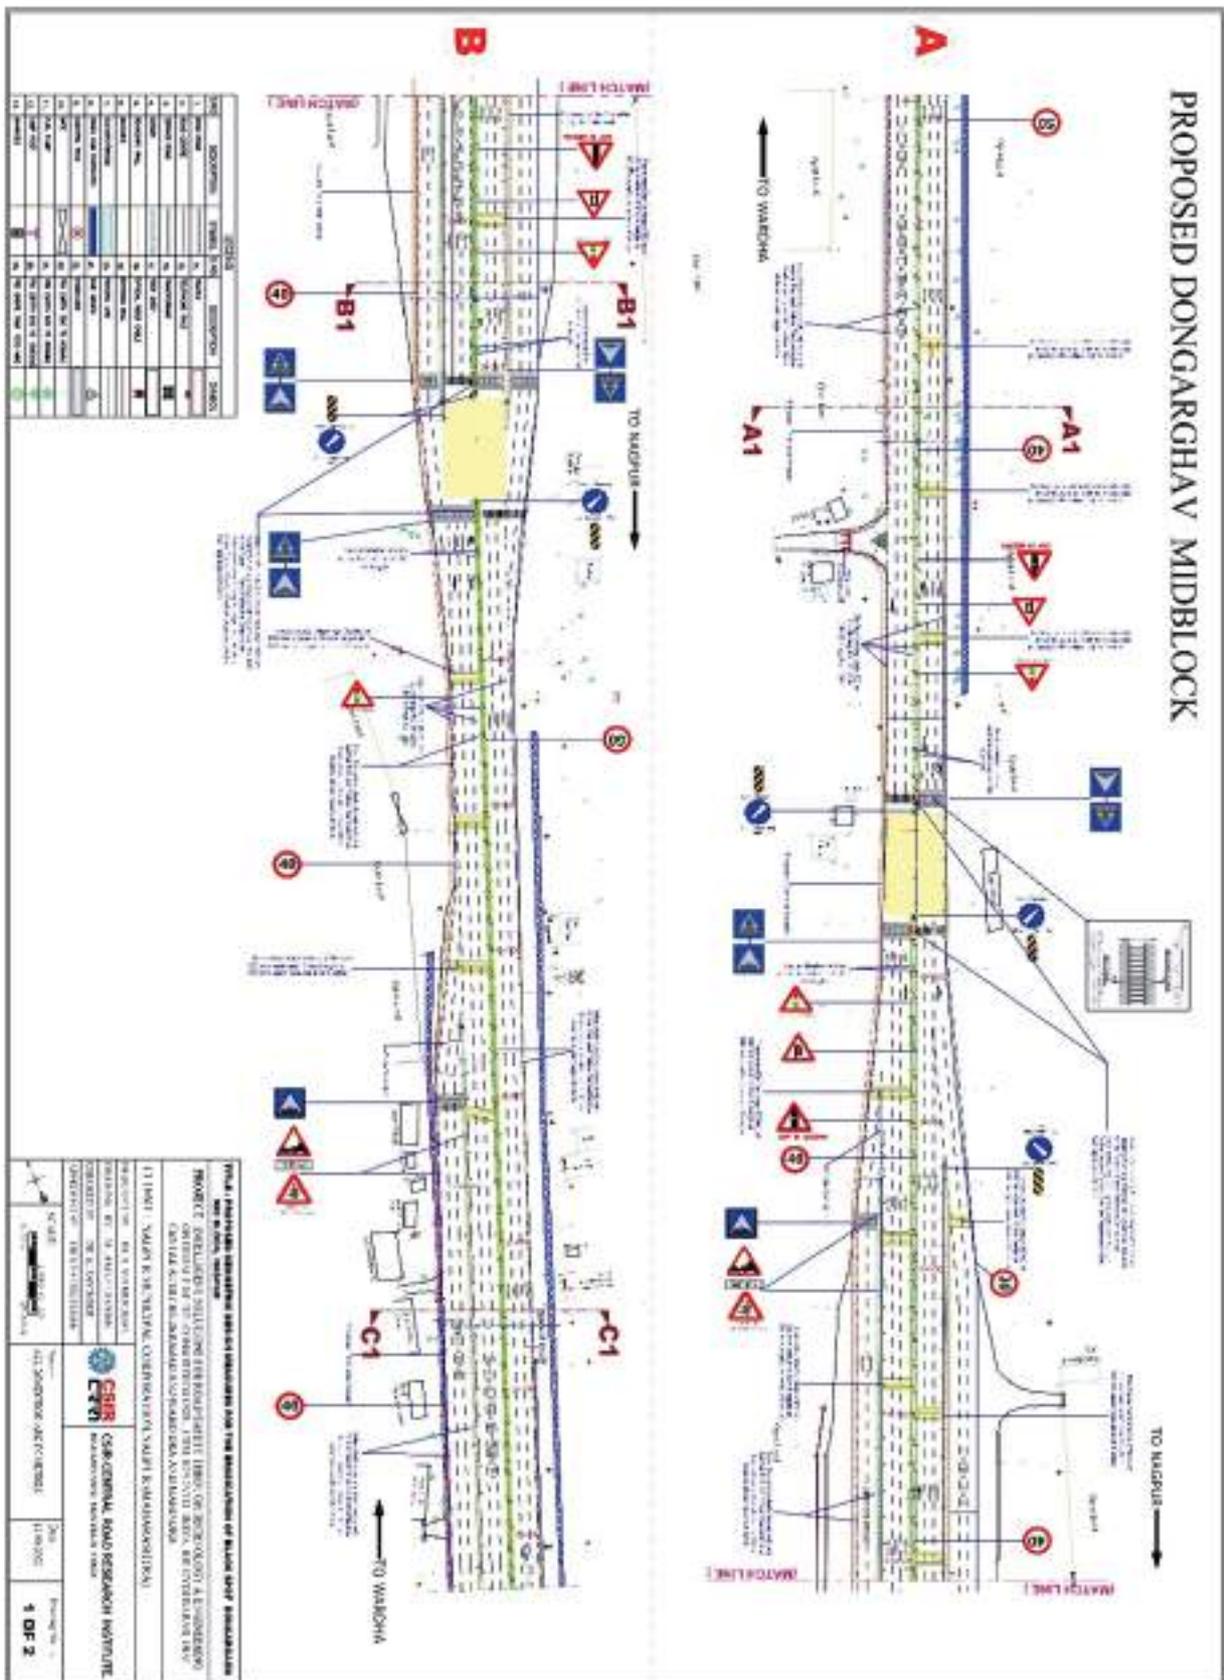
Detailed GDP for Dongargaon Midblock Road Stretch.
